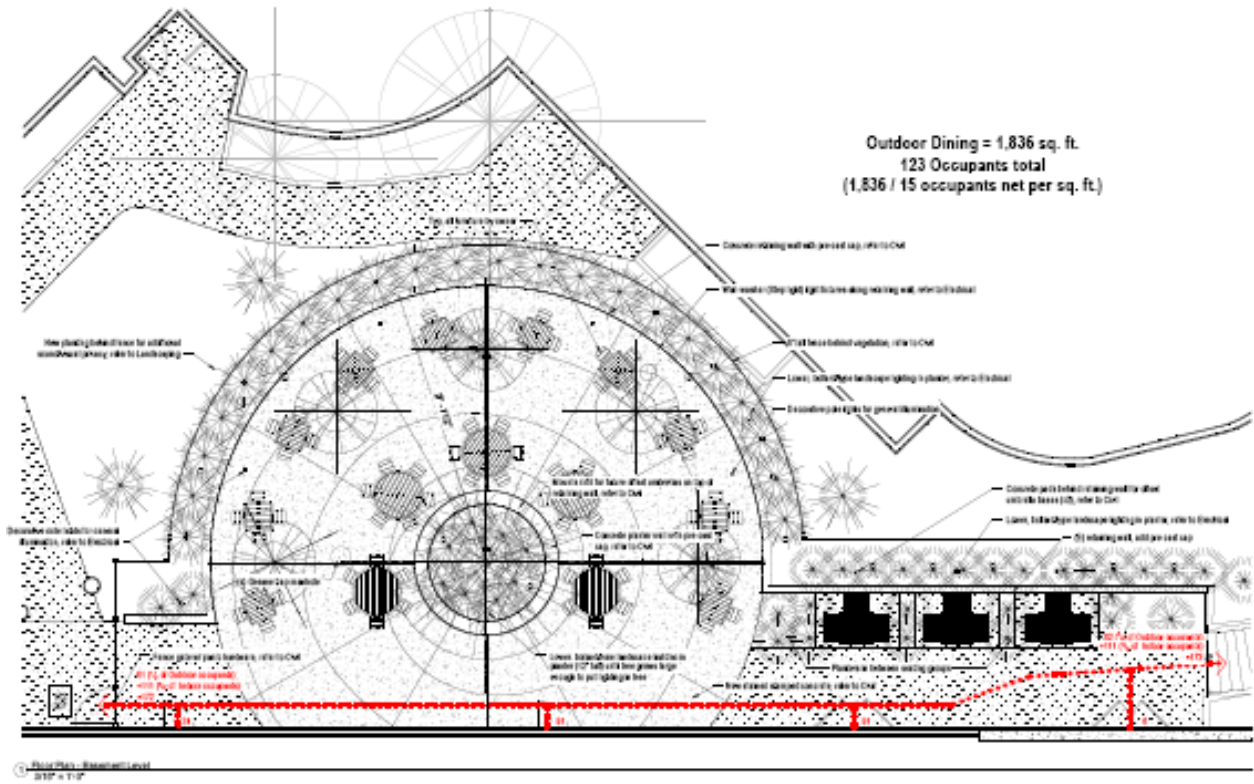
Site Plan Excerpt (Reduced Sheet A7.1)
